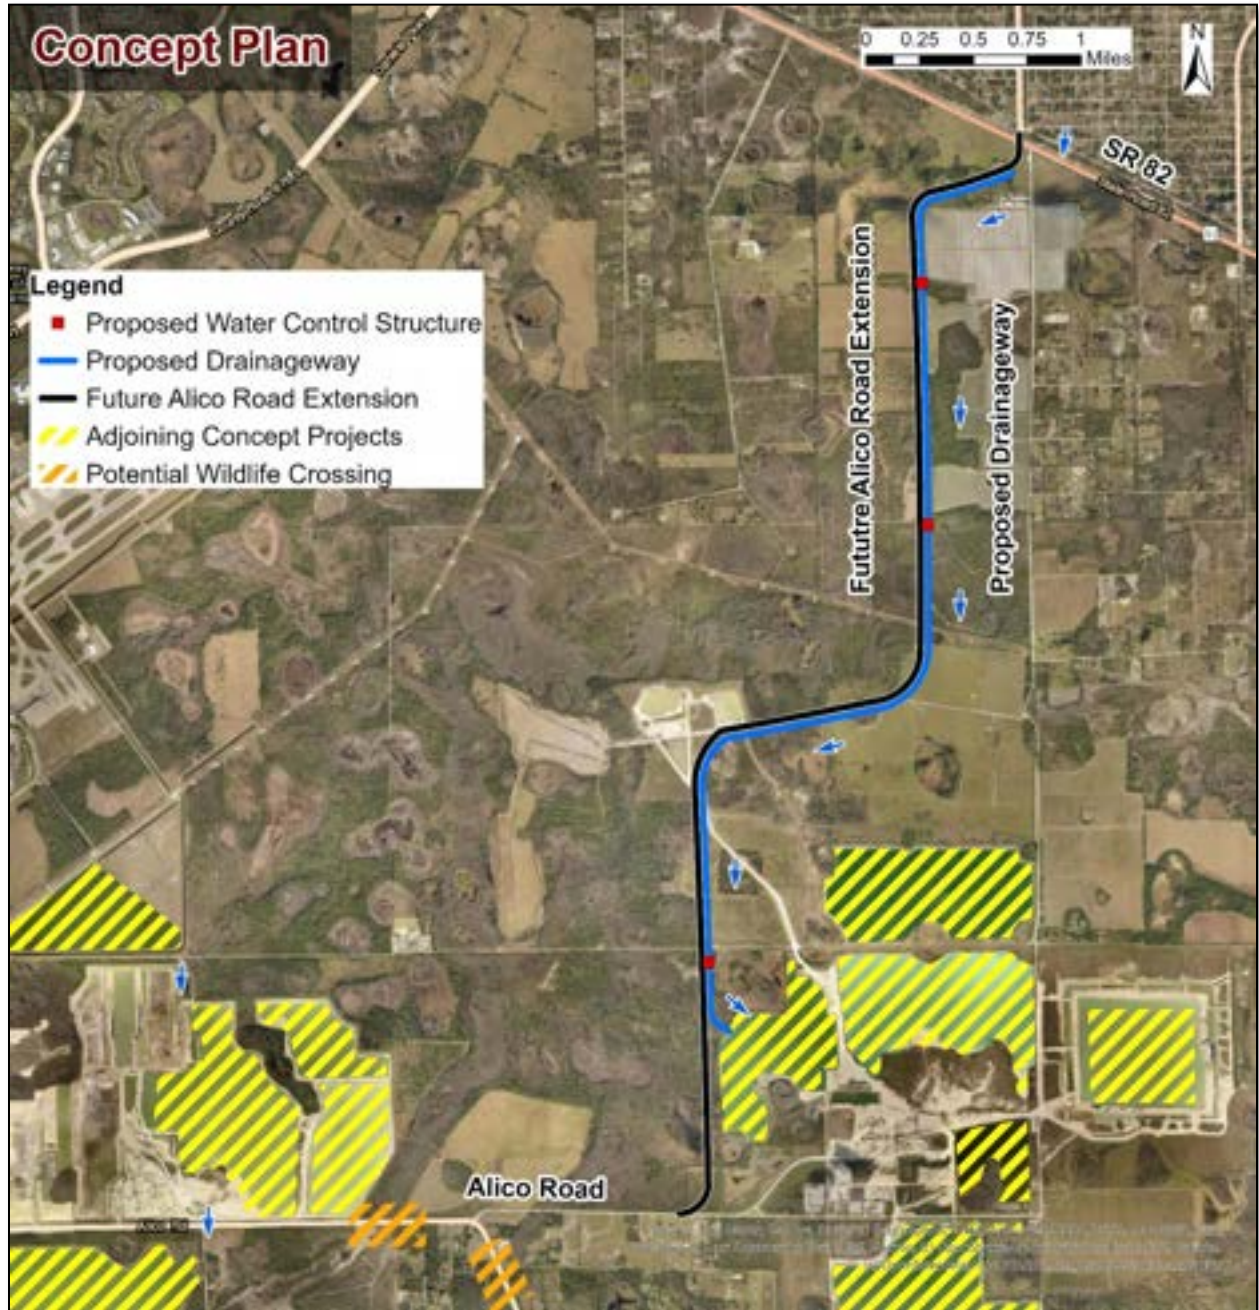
Concept Plan, 1.3.6 Alico Road Extension Drainageway
